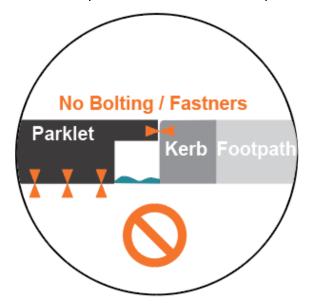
Structures must not be fixed to the pavement or the kerb upstands.
